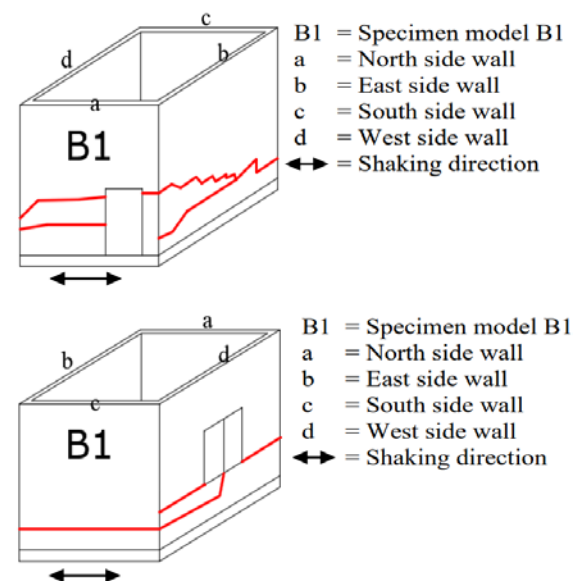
Schematic drawing of crack specimens at different sides of specimen walls
